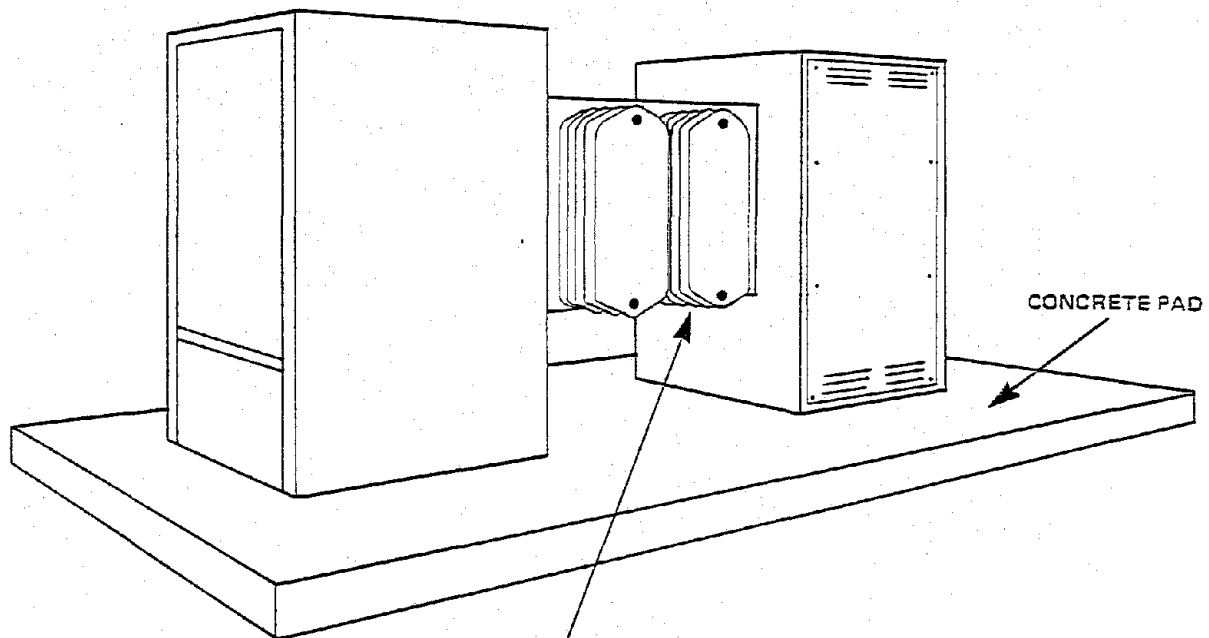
(a) Typical Transformer and Switch Gear on Concrete Mounting Pad
